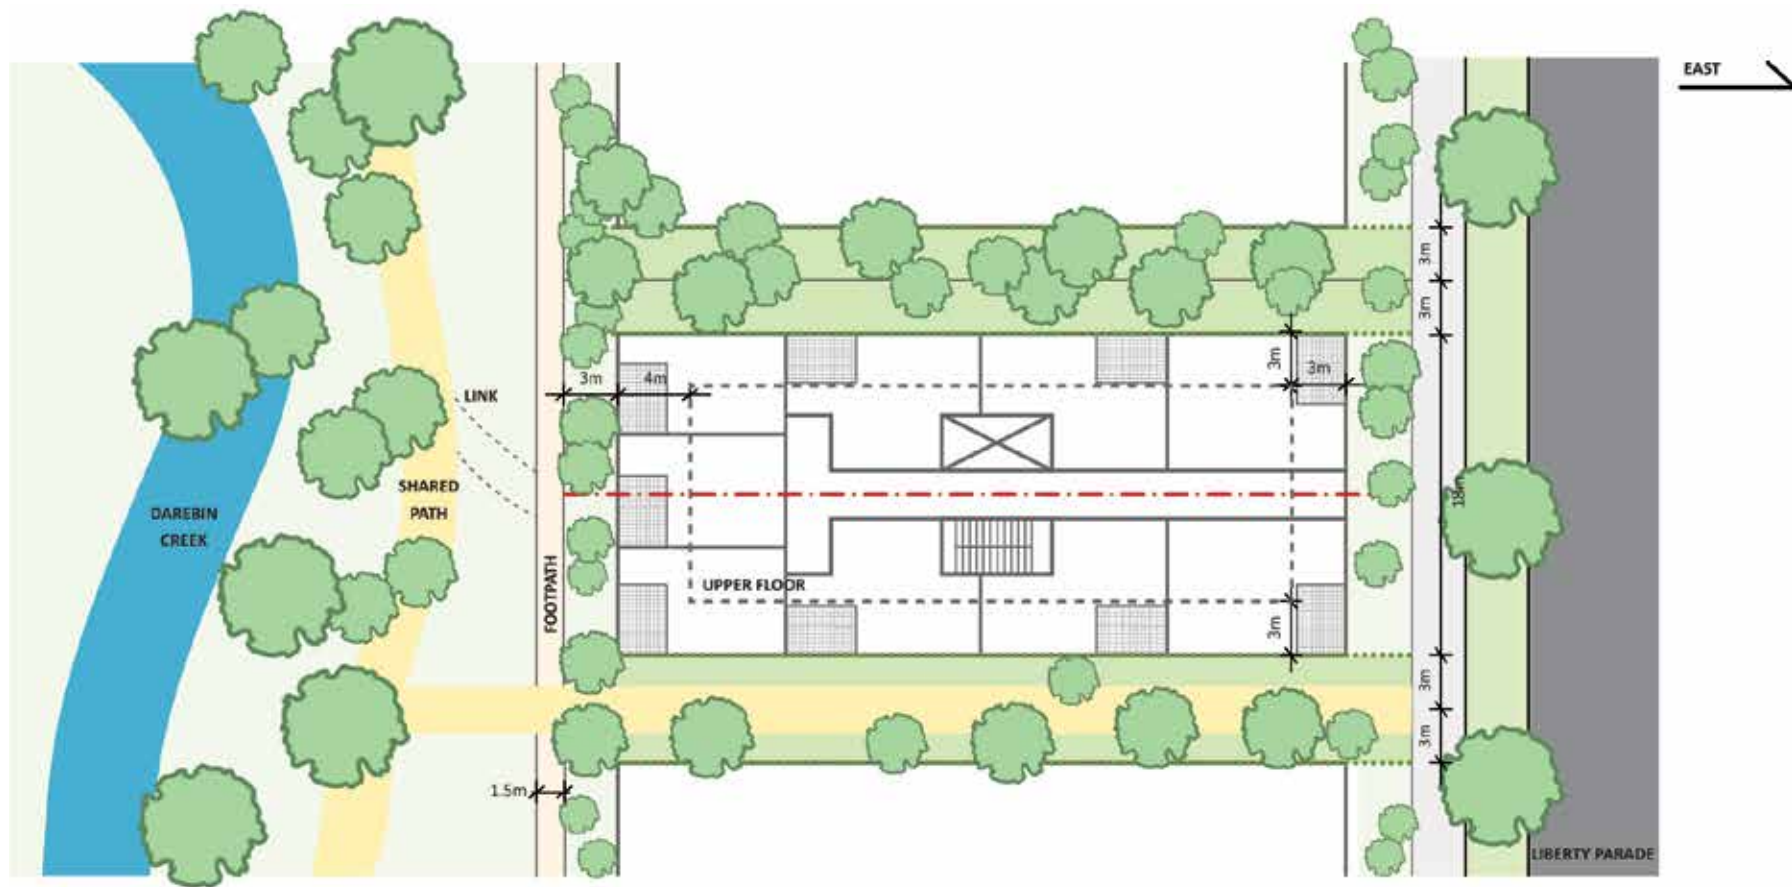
Typical Upper Floor Plan - Creekside (two lots consolidated)
